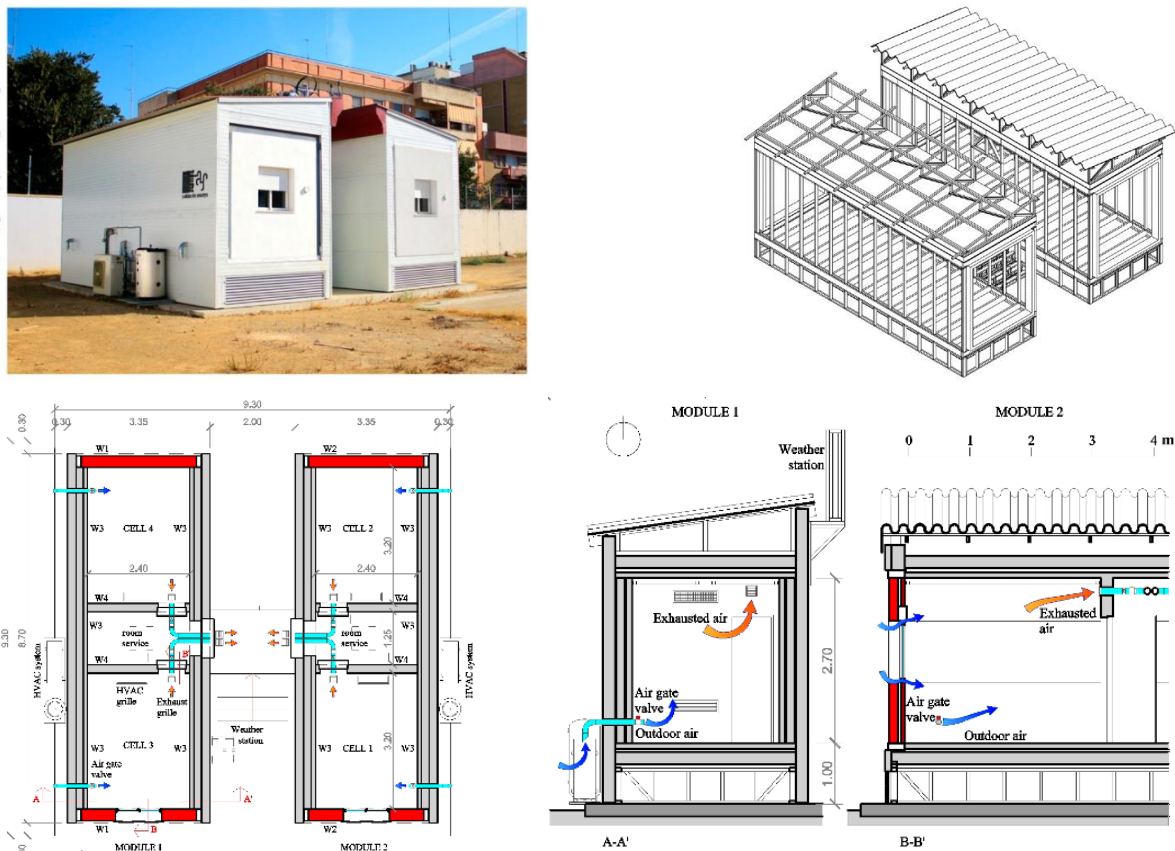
Picture of Test Cells Seville, timber construction, ground floor and cross-section [10]
